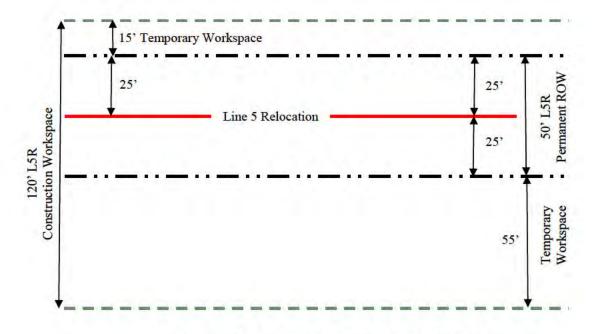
Typical Construction Workspace—Uplands
